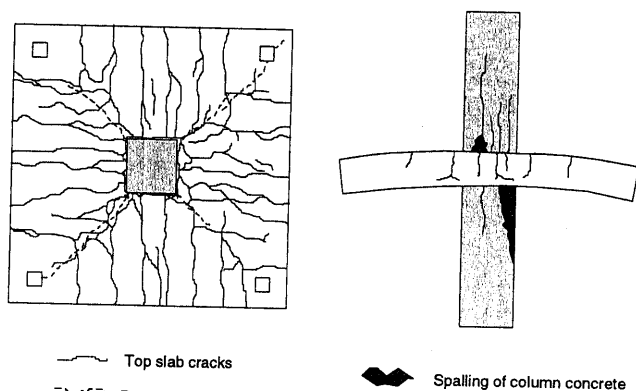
Cracking Pattern: Specimen B-2 (Loaded Slab)
